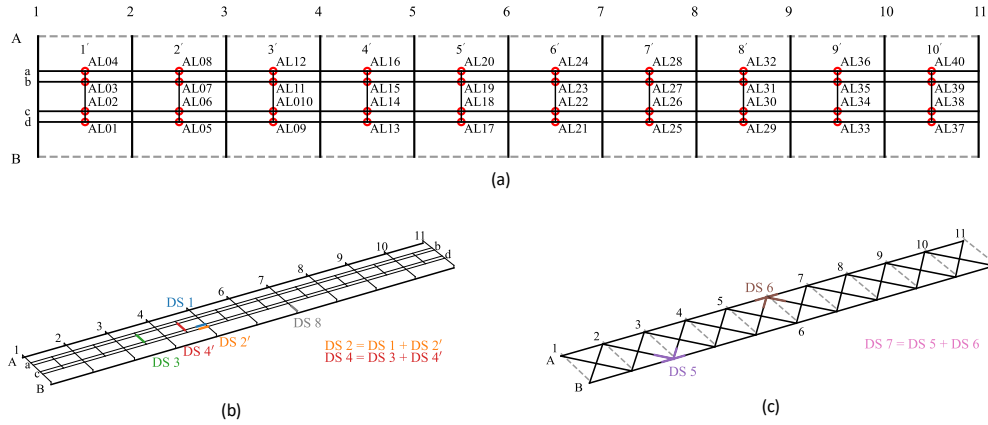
Overview of the experimental conditions. (a) Location and numbering of accelerometers on the bridge deck. (b) Damage locations on bridge deck. (c) Damage locations on the lateral bracing
